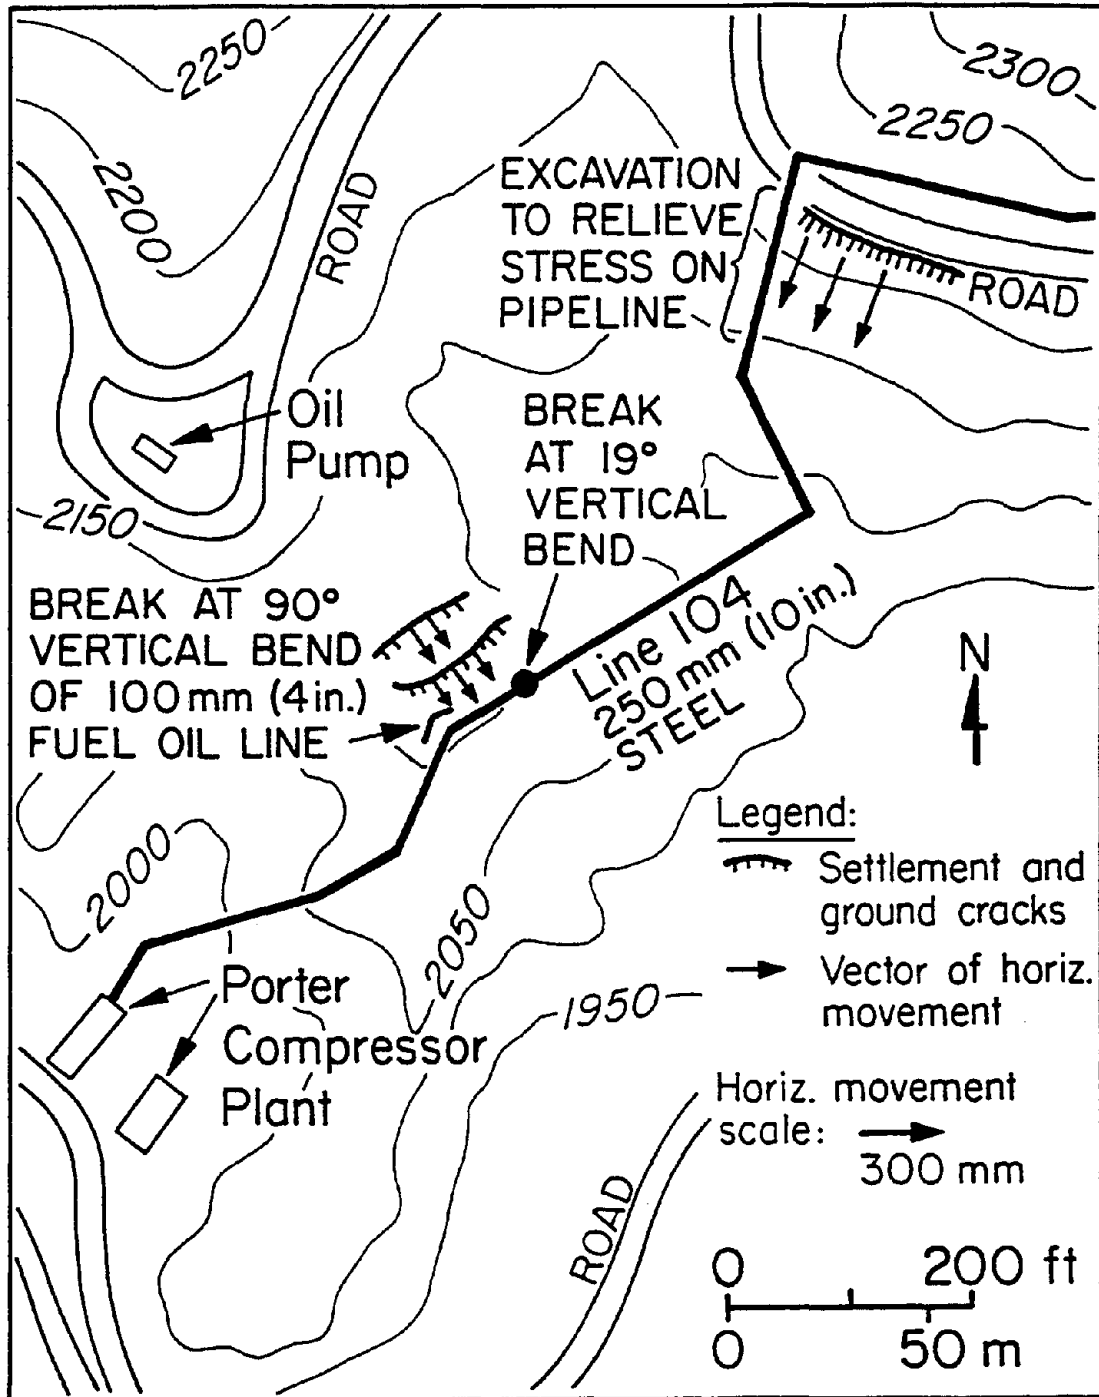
Plan view of Line 104 in the Aliso Canyon Gas Storage Field.
